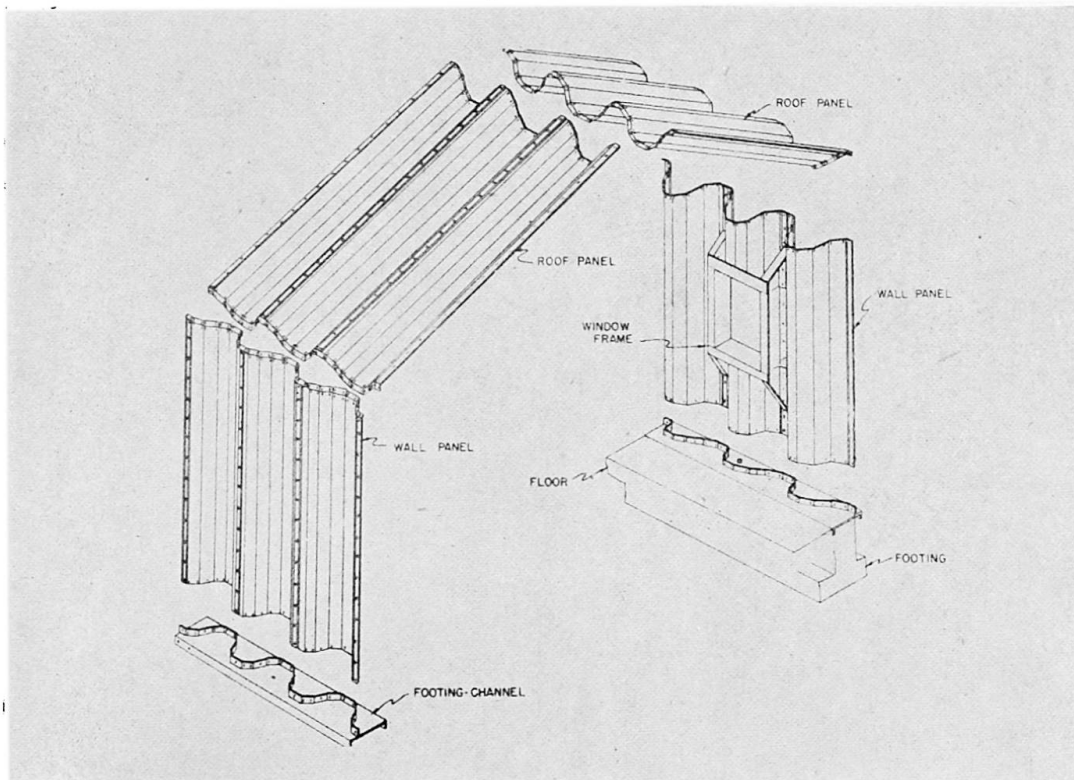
Construction details of frameless building of Fig. 10. Individual, rigid trough members up to 34 in. wide, 7.5 in. deep (Behlen Manuf. Co.)
